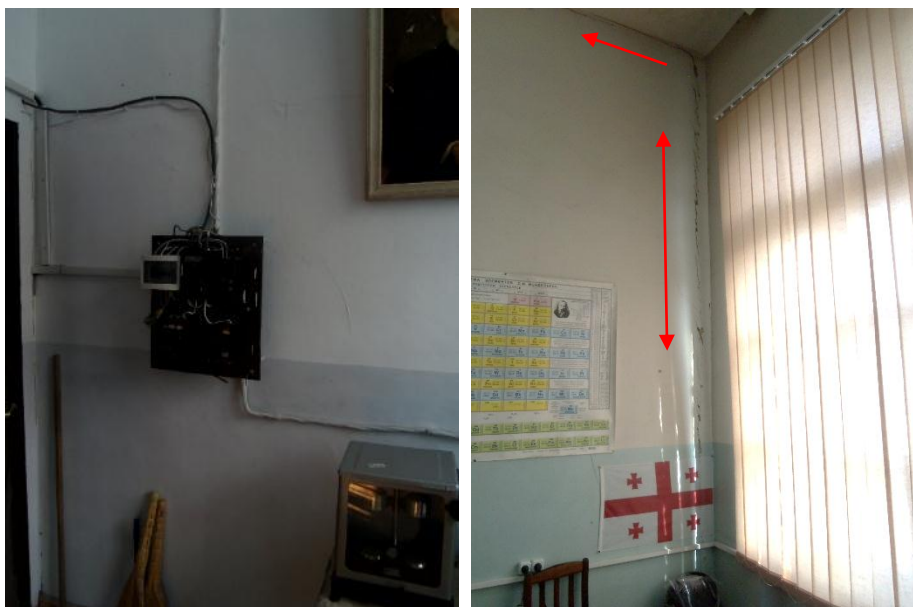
Above Right: exposed circuit board in refurbished laboratory Above Left: structural crack in concrete running up wall and across ceiling
